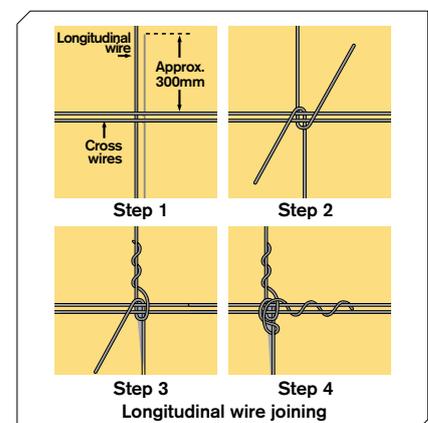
Method for joining longitudinal wires and cross wires (steps 1 to 4).
